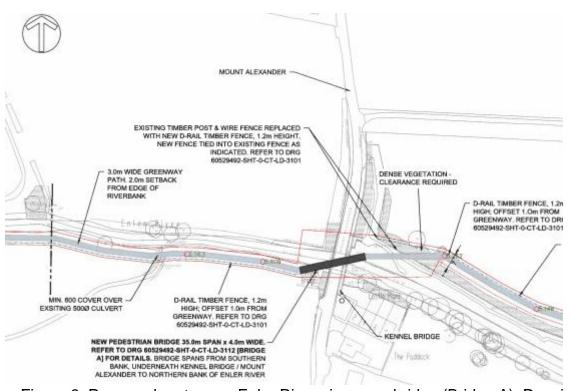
Proposed route over Enler River via a new bridge (Bridge A). Drawing 30.
